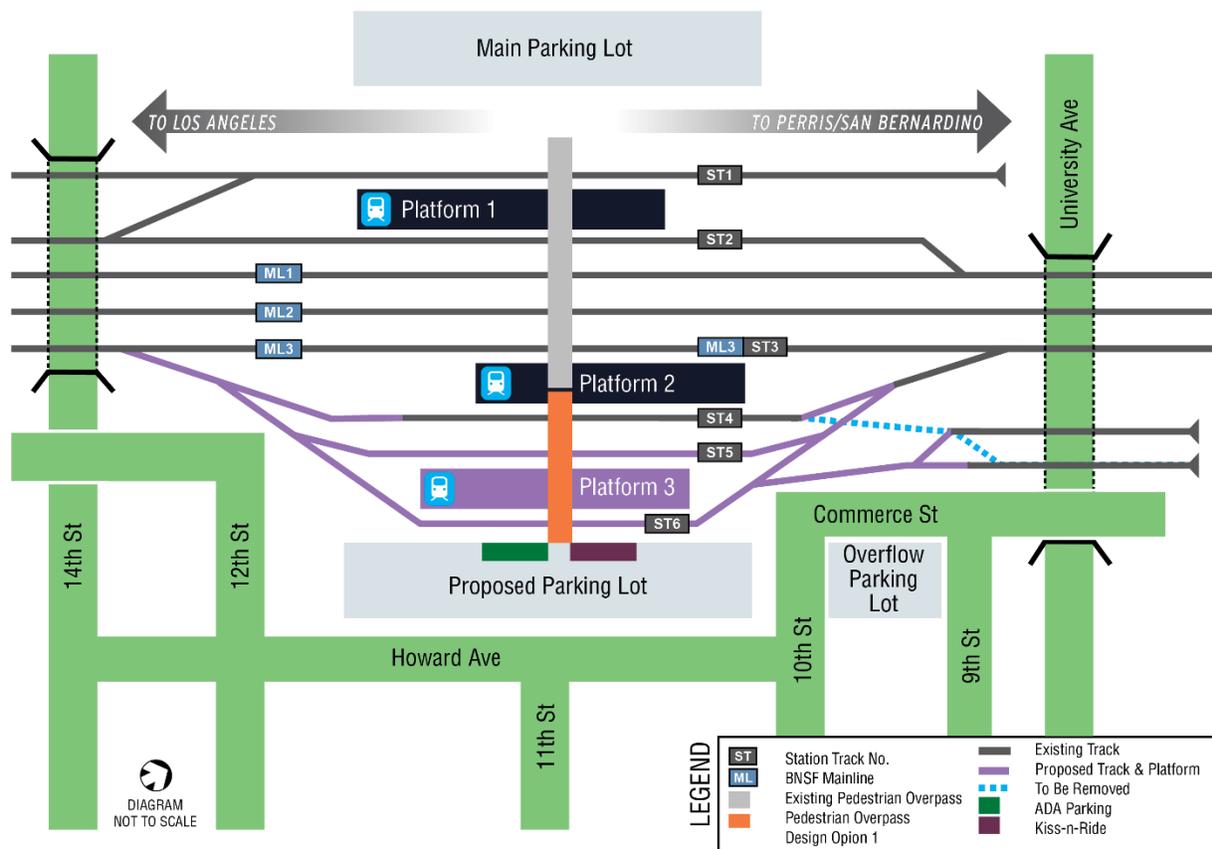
Build Alternative with Pedestrian Overpass Access Design Option 1
